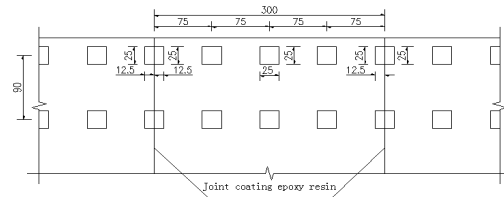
The reserved steel in Prefabricated concrete deck (unit cm)
